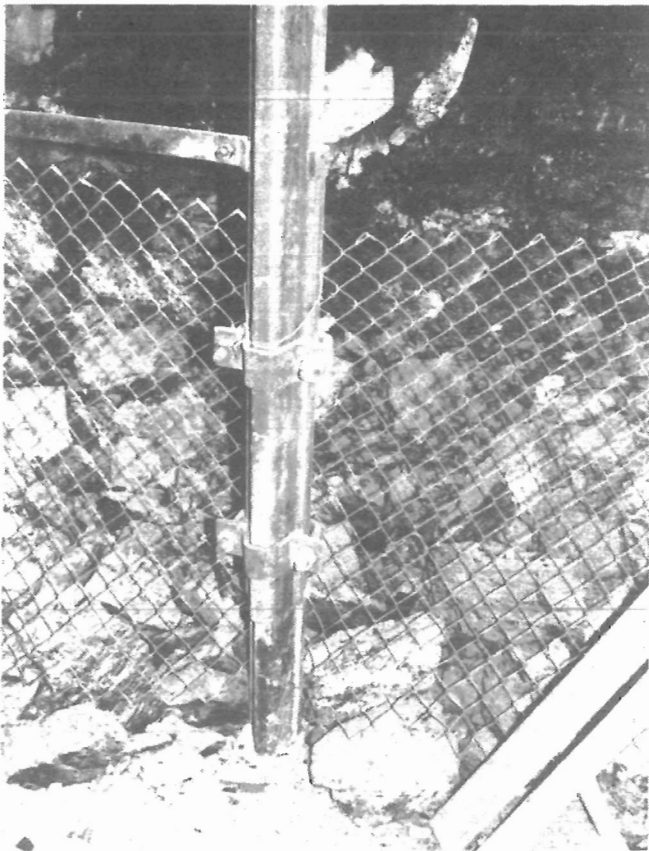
U-bolt clamp assembly. (Courtesy Dosco Corp.)
